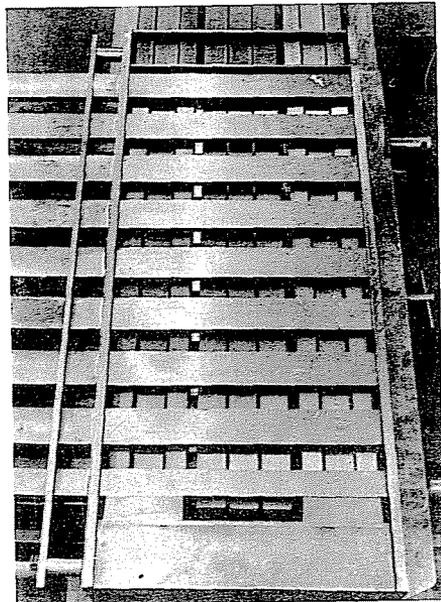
Manufacturing apparatus for floor elements. *The system of keys.
